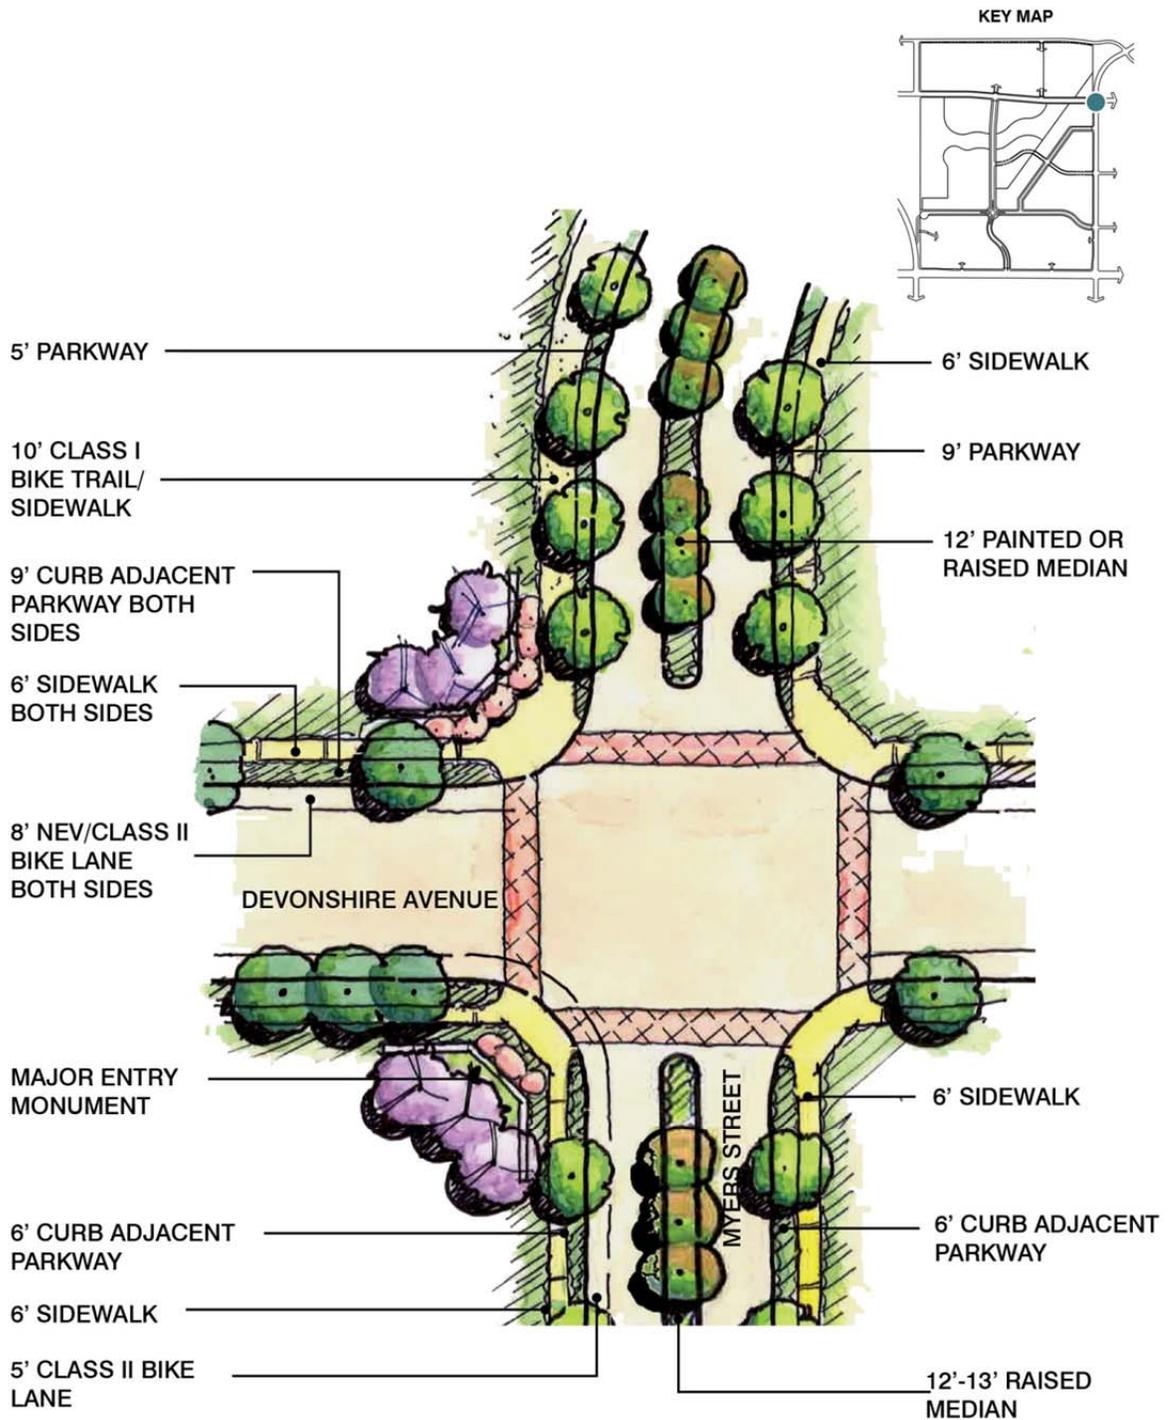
Detail of Myers Street and Devonshire Avenue Intersection
